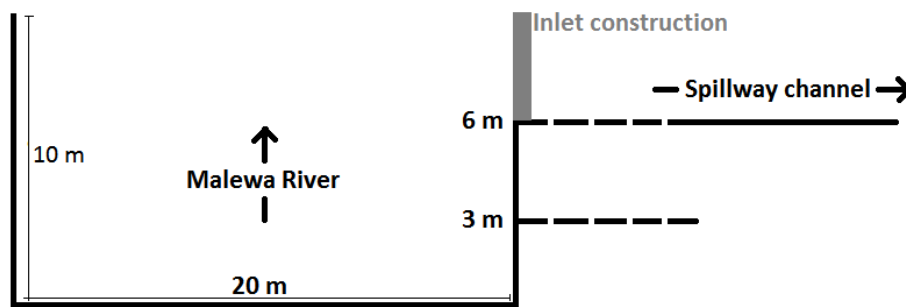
INLET CONSTRUCTION CONNECTING MALEWA RIVER AND SPILLWAY CHANNEL
